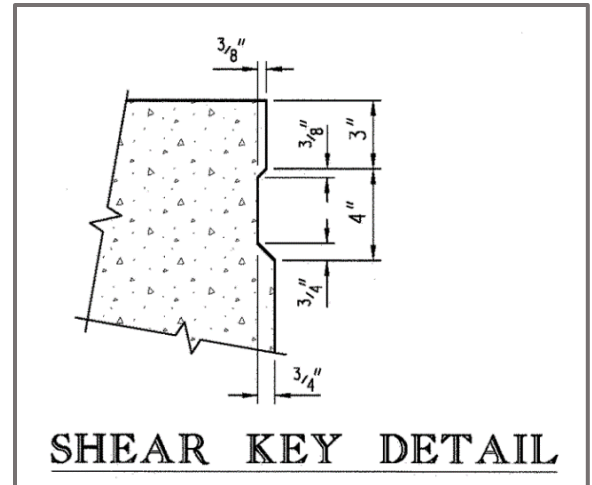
Hollow-core beam shear key detail with minimum 0.75-inch joint opening © 2018 SCDOT
